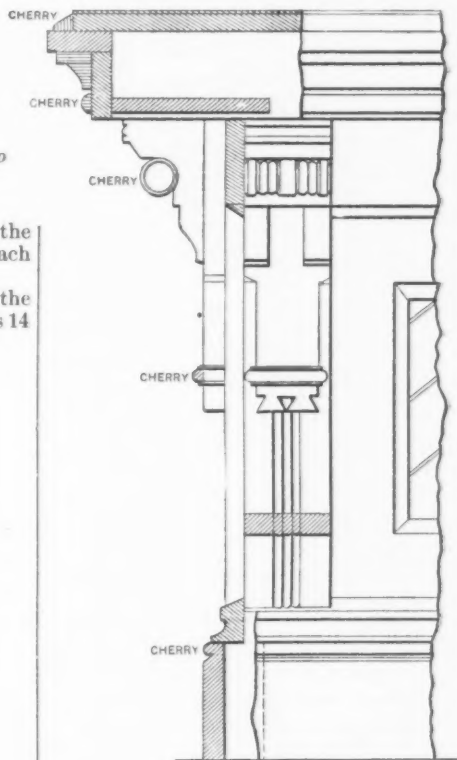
Sectional Elevation of Counter.—Scale, ¾ Inch to the Foot.
